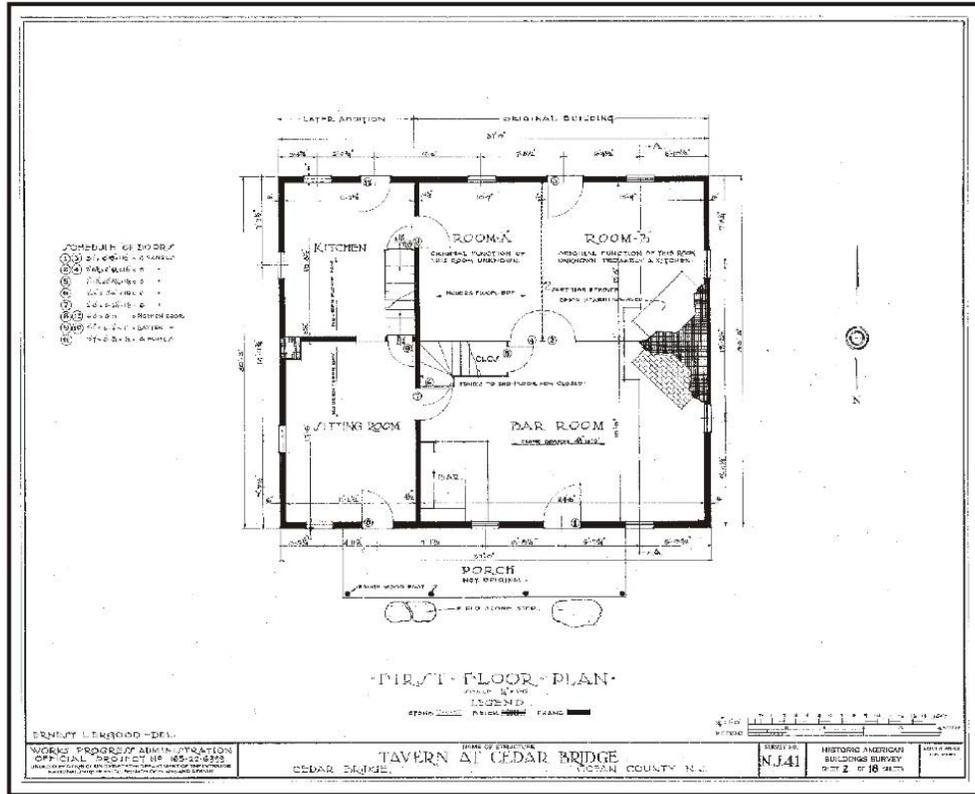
1938 HABS. First Floor Plan of the Tavern at Cedar Bridge (Survey No. N.J. 41).
